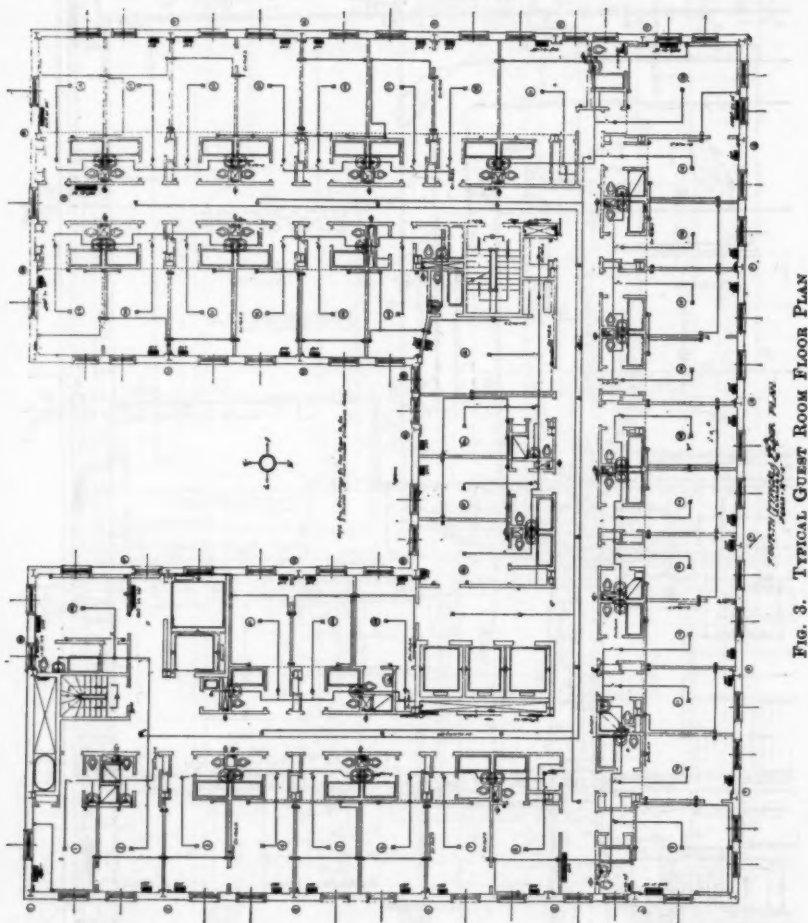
TYPICAL GUEST ROOM FLOOR PLAN
